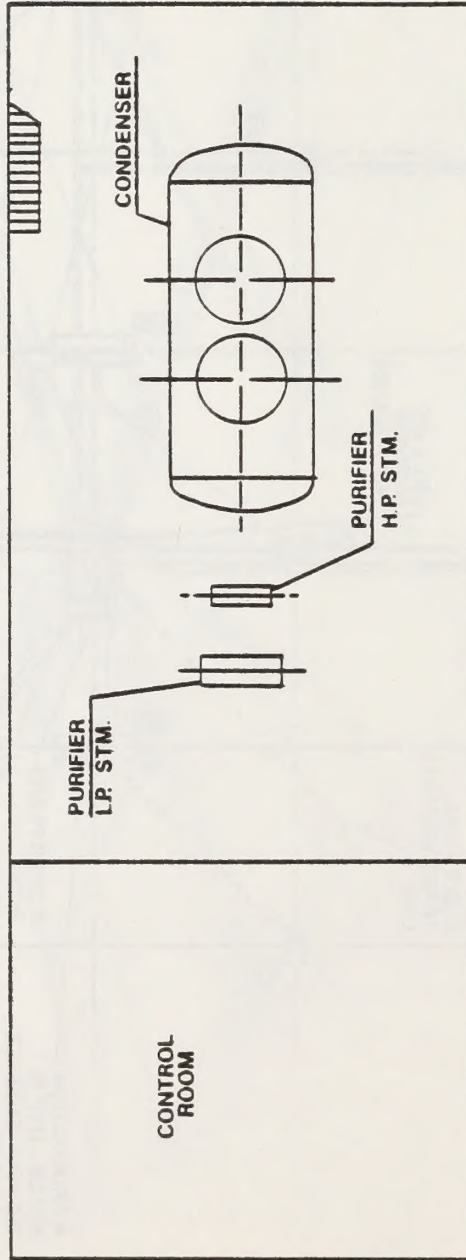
TYPICAL PLOT PLAN FOR FIELD DEVELOPMENT
